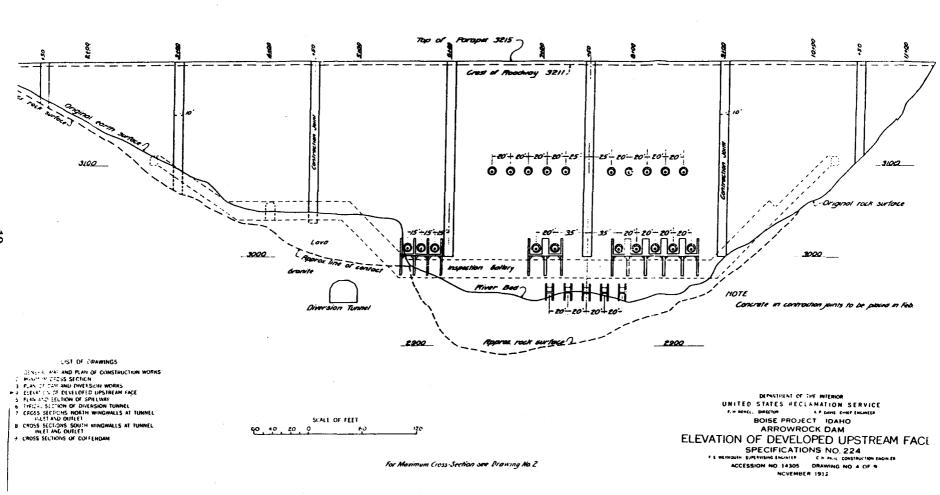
Arrowrock Dam, elevation of developed upstream face.
